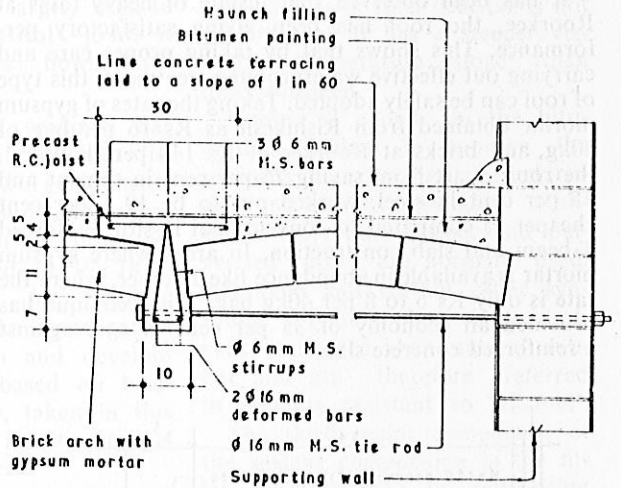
Brick arch laid in gypsum mortar with precast I-joist
